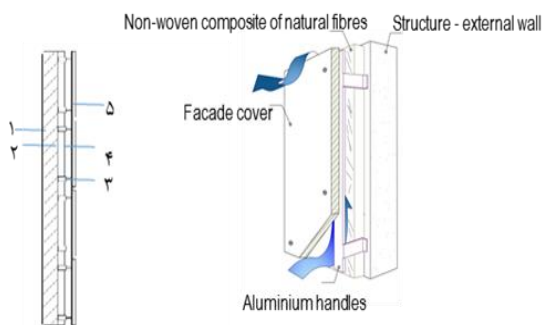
Left) Cross section, 1. Internal wall of 22 cm solid brick, 2. Non-woven composite of natural fibers, 3. Aluminium handles, connecting the facade covering to the inner wall, 4. Air layer, 5. Facade covering.
